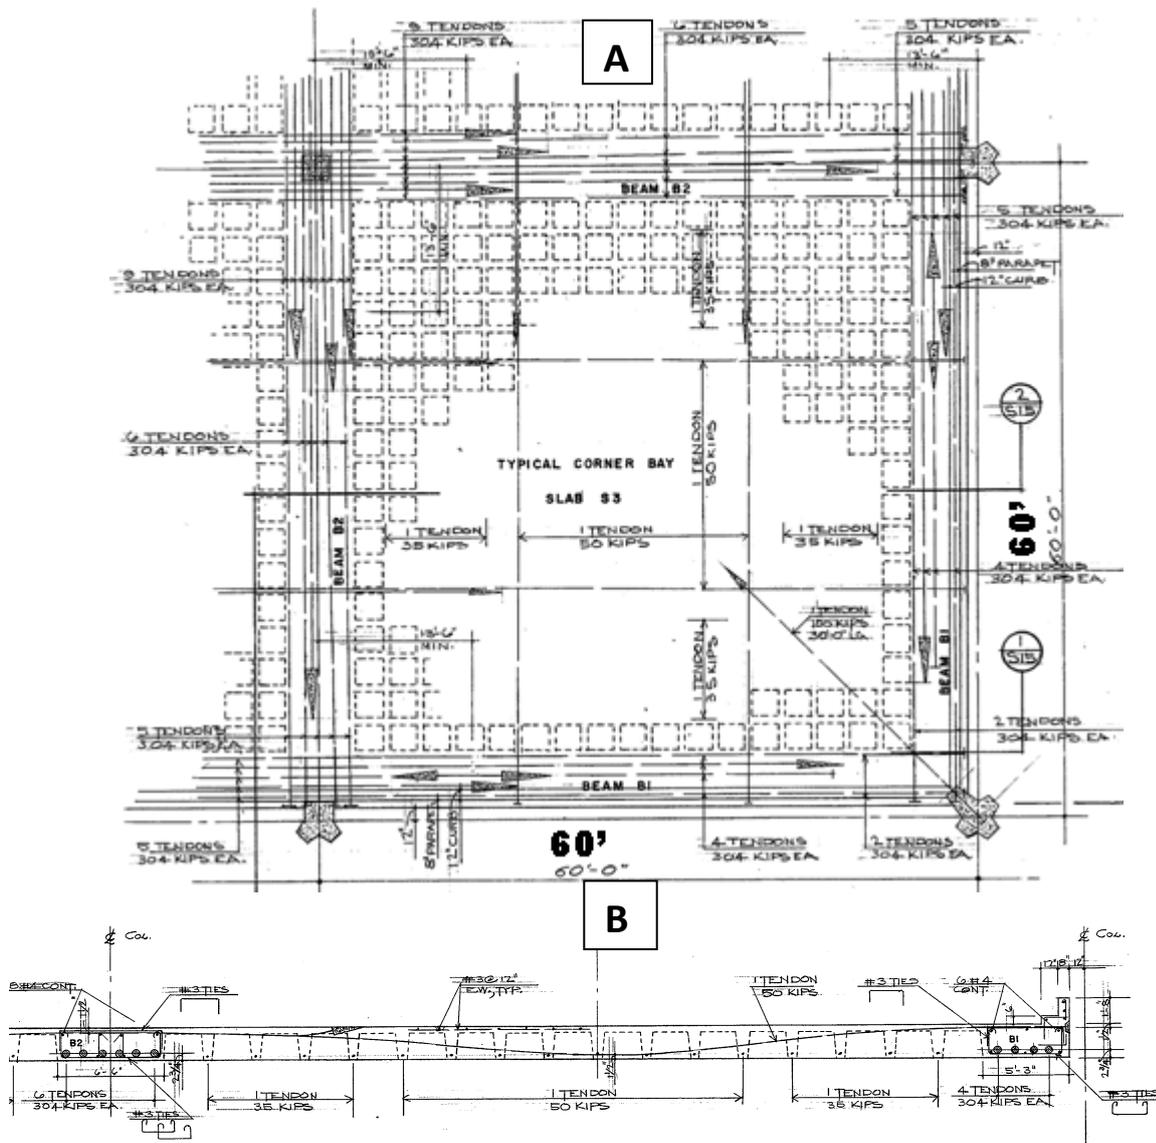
Plan (A) and Section (B) of a Corner Waffle Slab
